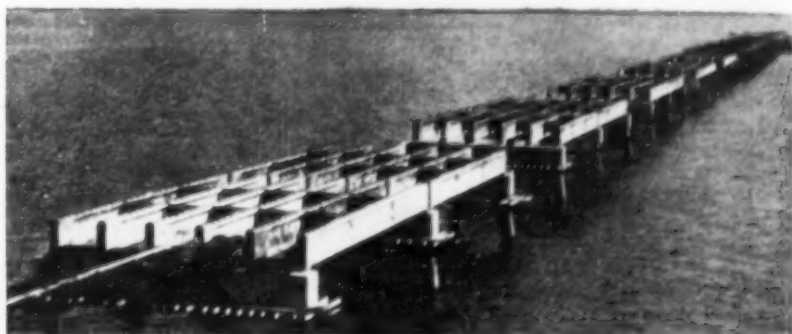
Example of Transverse Diaphragms (Tampa Bay Bridge).
